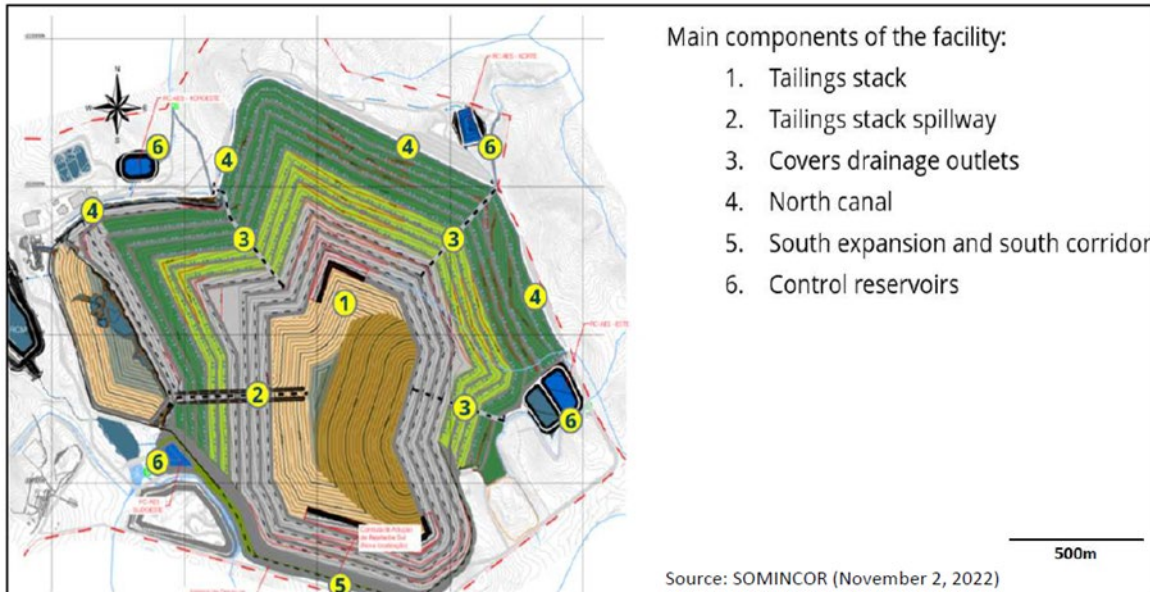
Cerro do Lobo Tailings Storage Facility Layout (Final Configuration)
